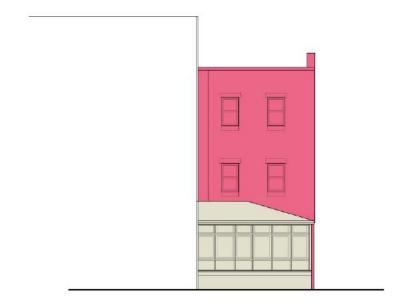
Grading of Significance, north elevation, TKD Architects (not to scale)
